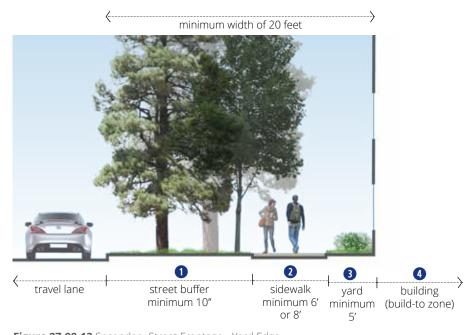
Secondary Street Frontage - Yard Edge
